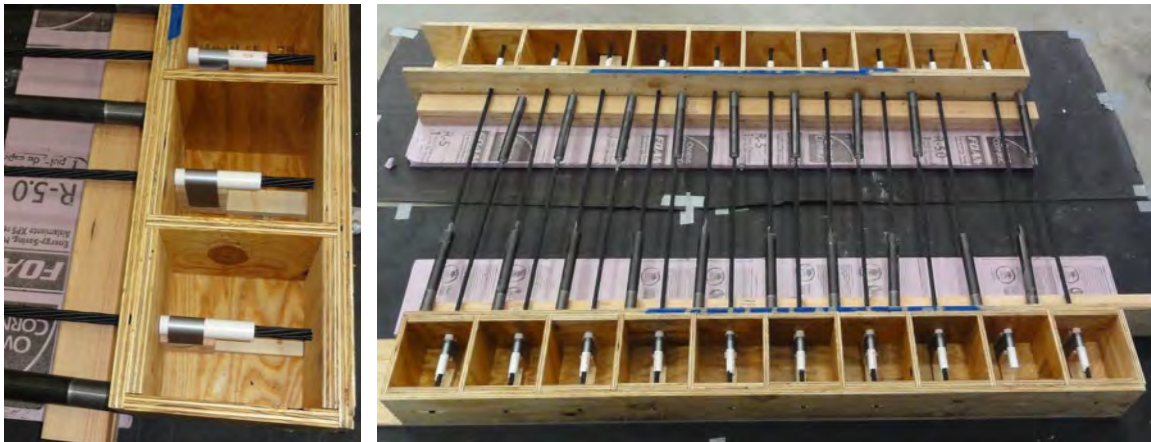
CFCC specimens in the formwork before pouring the concrete
